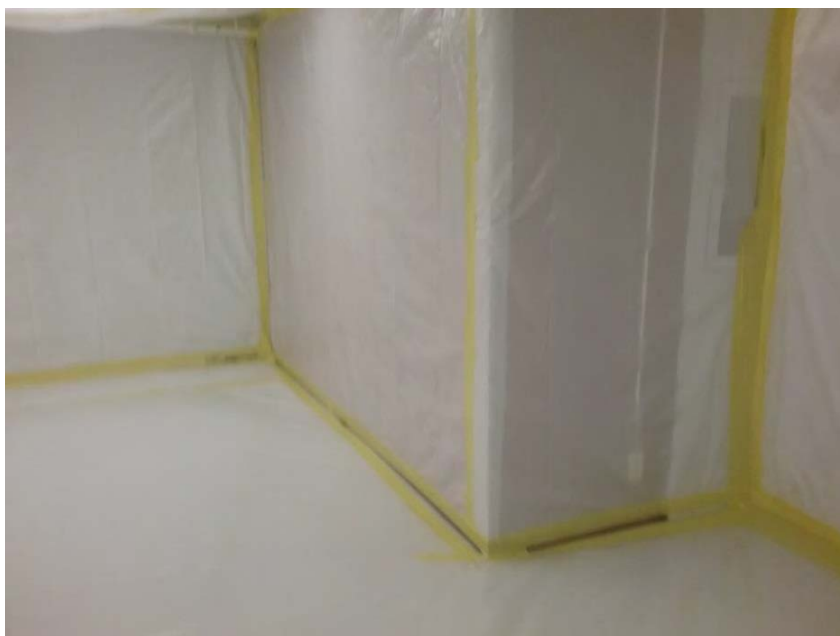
Depicting Corner Closet of Multipurpose Room following installation of enclosure isolating walls, ceiling and floor.
